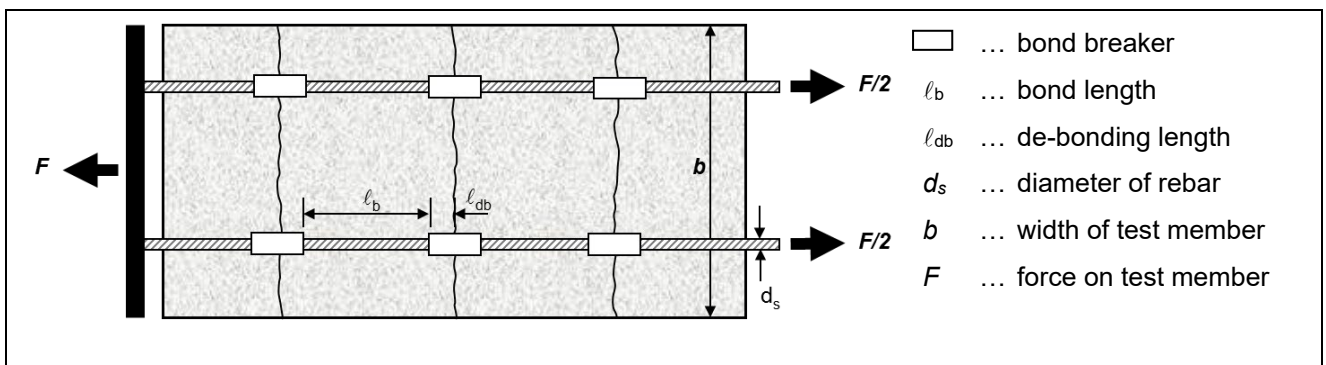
Example for test member with bond breaking pipes on rebar (plan view)
